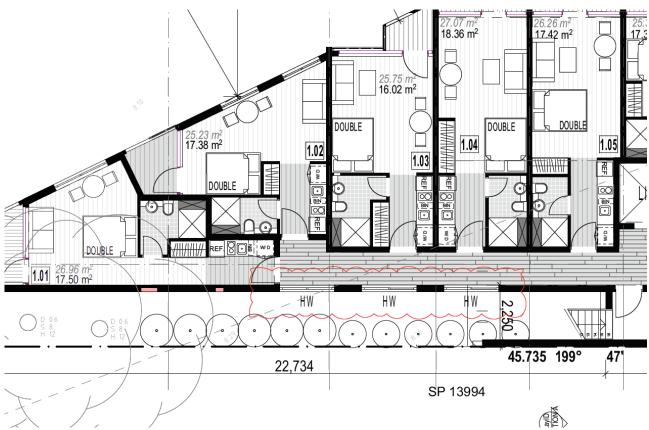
Extract of the proposed first floor plan noting the enclosure of the previously open circulation corridors on the eastern side elevation.
